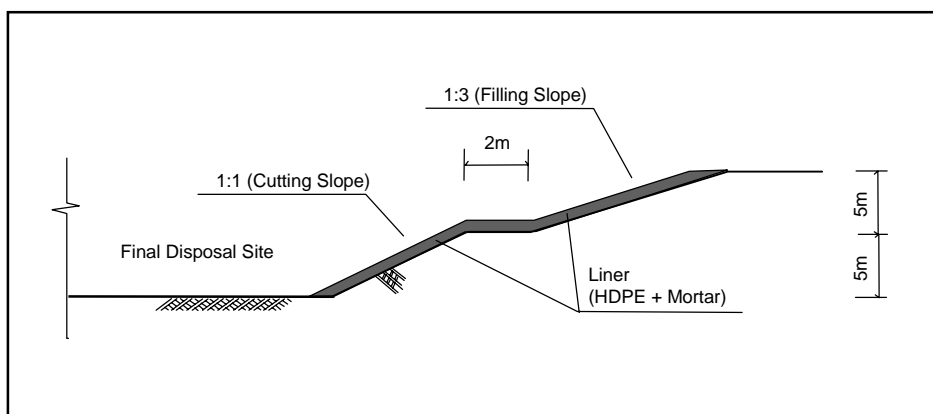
Typical Section of Slope with a Liner (HDPE+Mortar)
